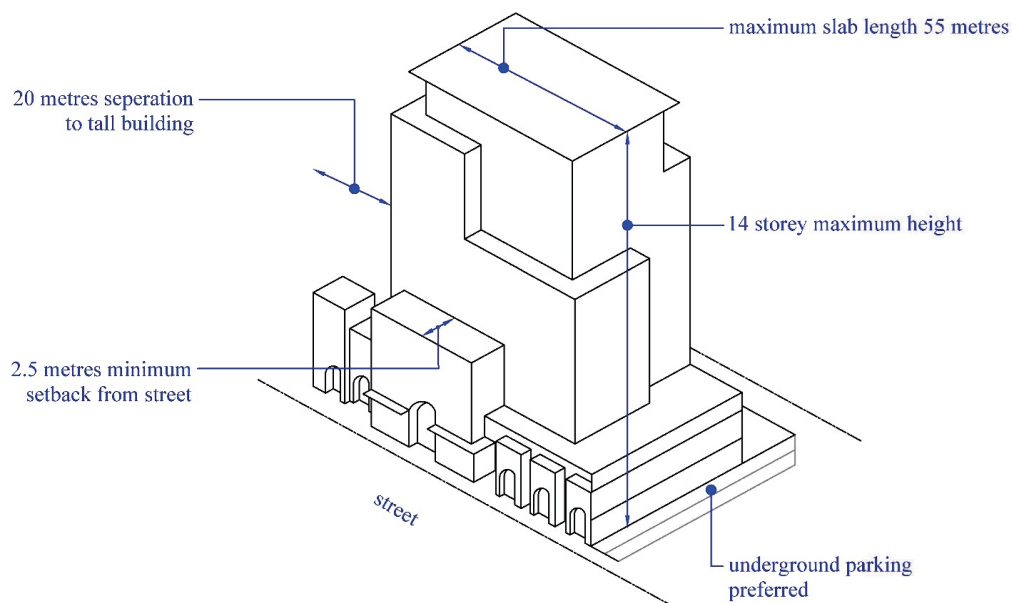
A.F5: Illustration of Above Street Wall and Podium Development Standards
